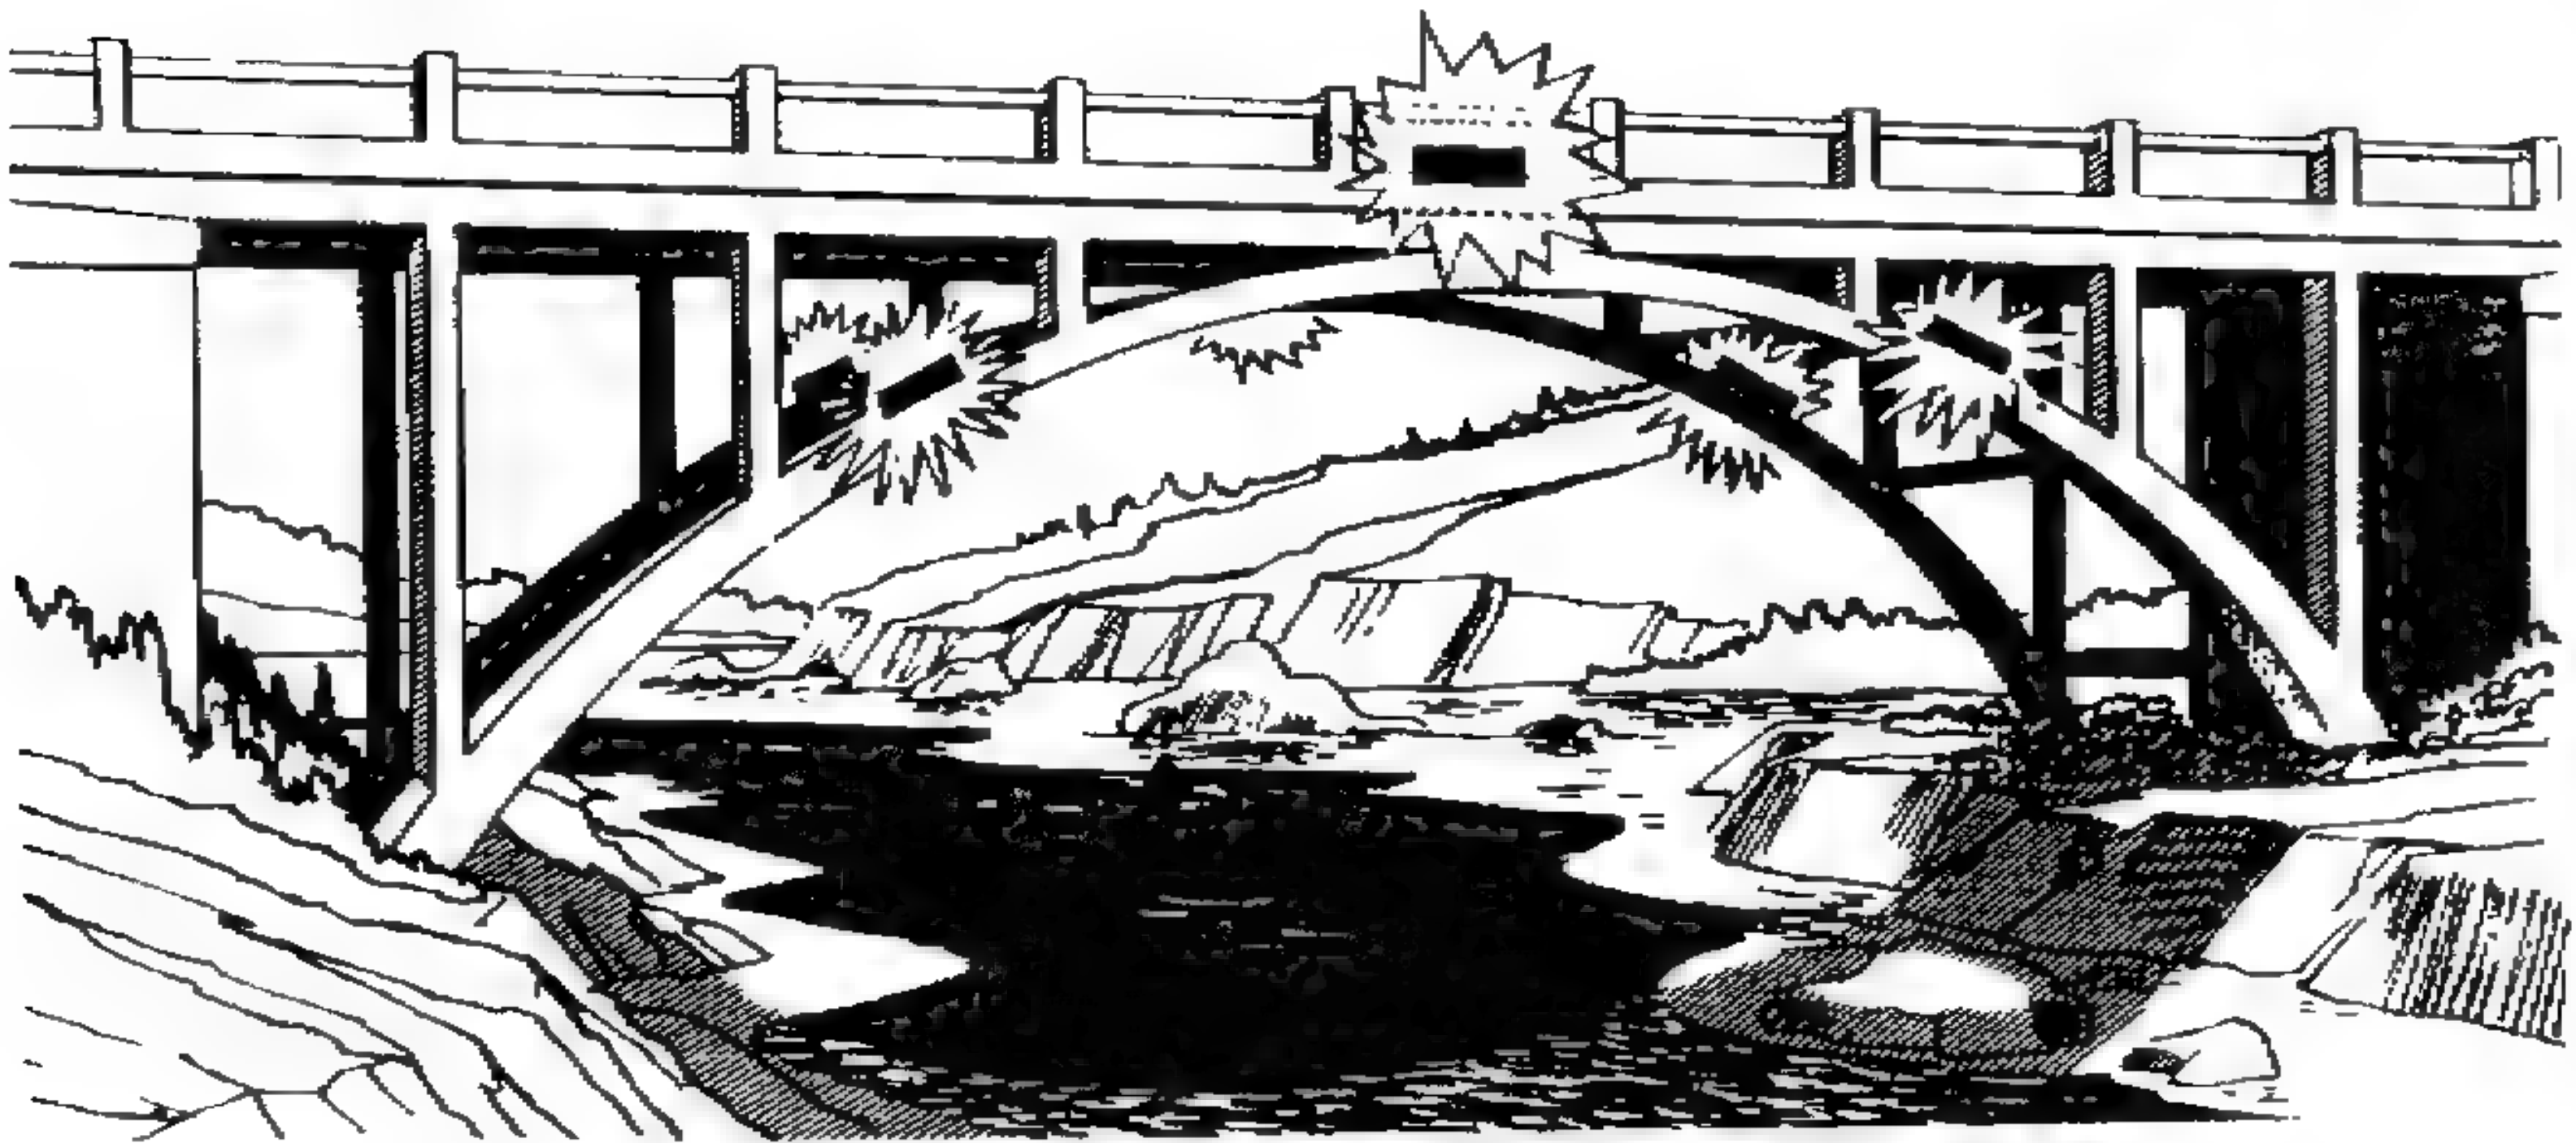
Demolition of reinforced-concrete open-spandrel arch bridge
